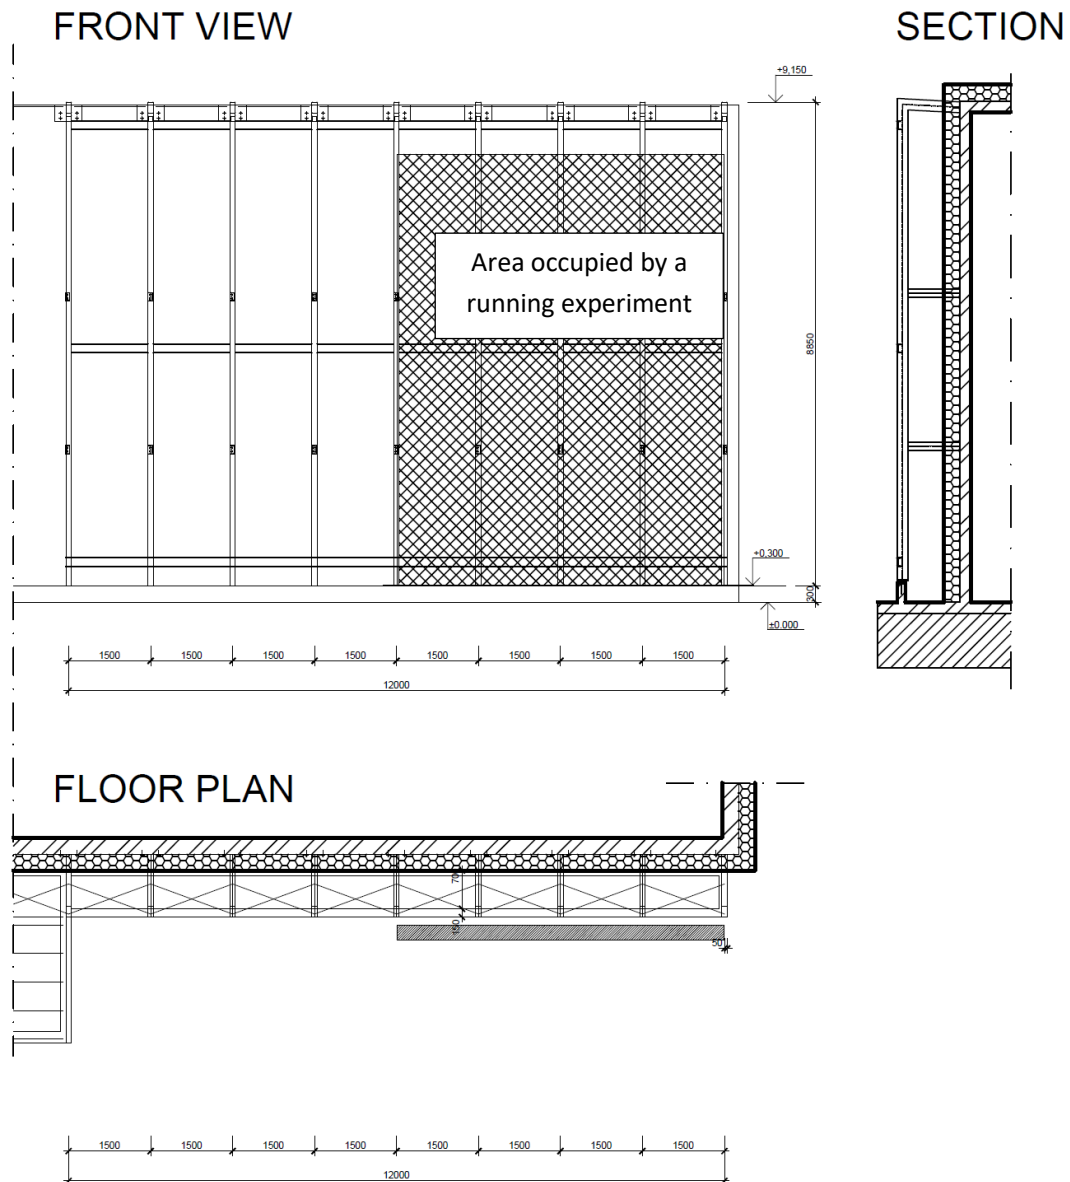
DRAWINGS OF THE SOUTHERN FACADE FOR DEMO INSTALLATION
